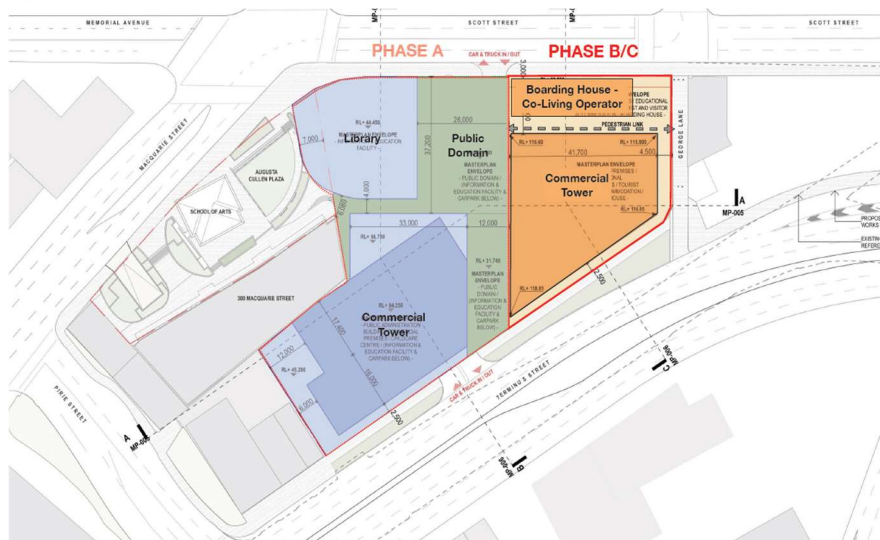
Liverpool Civic Place Phase B/C site (subject site) (Source: FJMT Architects)
